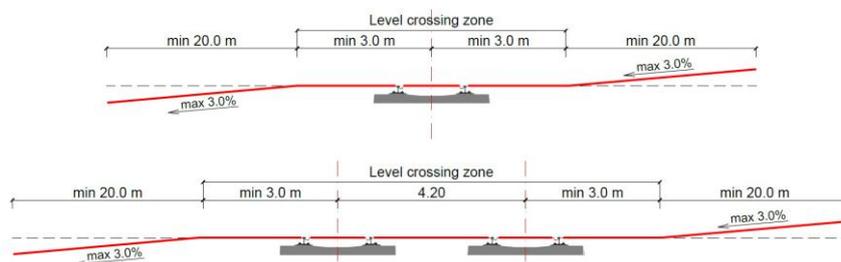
Longitudinal profile of the road in the area of the level crossing on a single-track (up) and double-track (down) railway.
